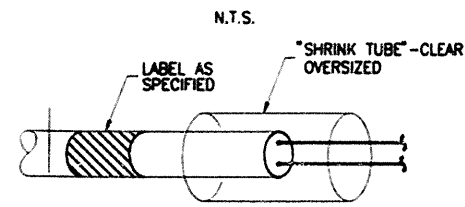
DETAIL "B" - TYPICAL CABLE LABELING METHOD
